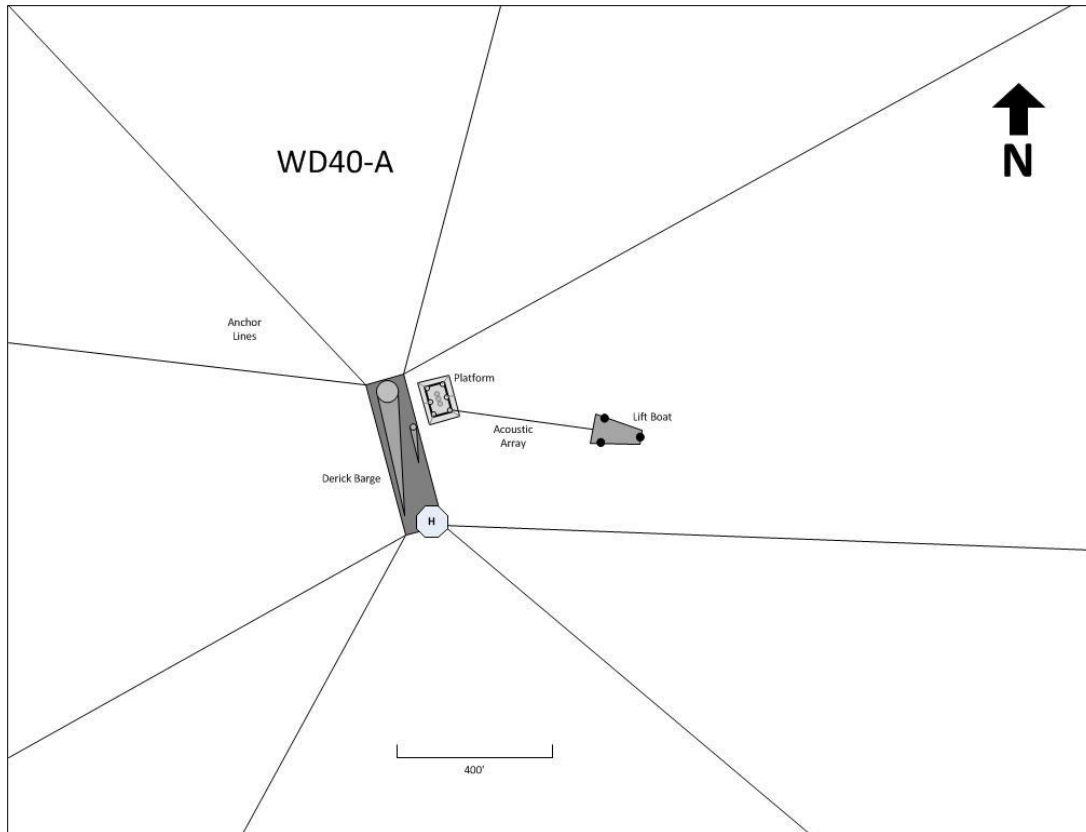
Top-down view of the project equipment arrangement showing the derrick barge with anchor lines, lift boat (recording platform), and platform.
